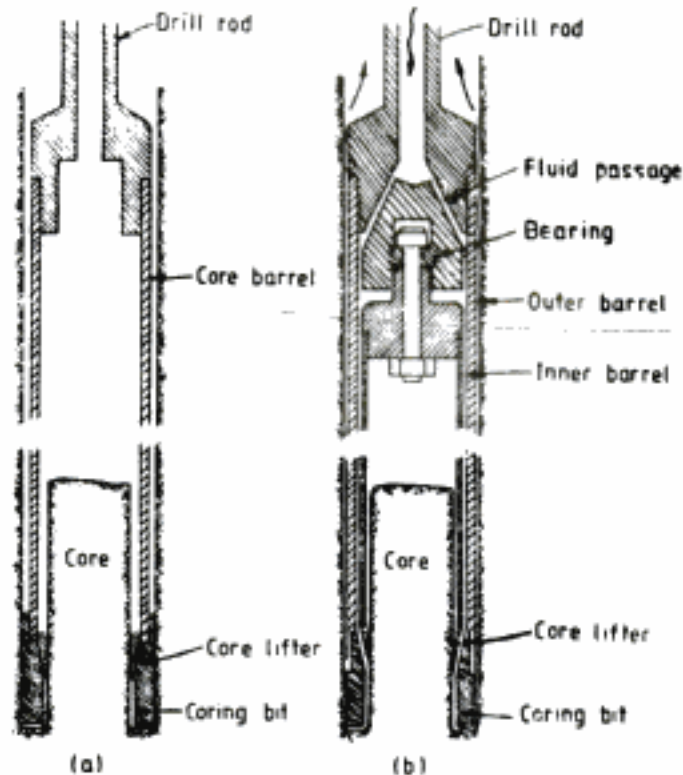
Core barrels: (a) single tube, and (b) double tube
